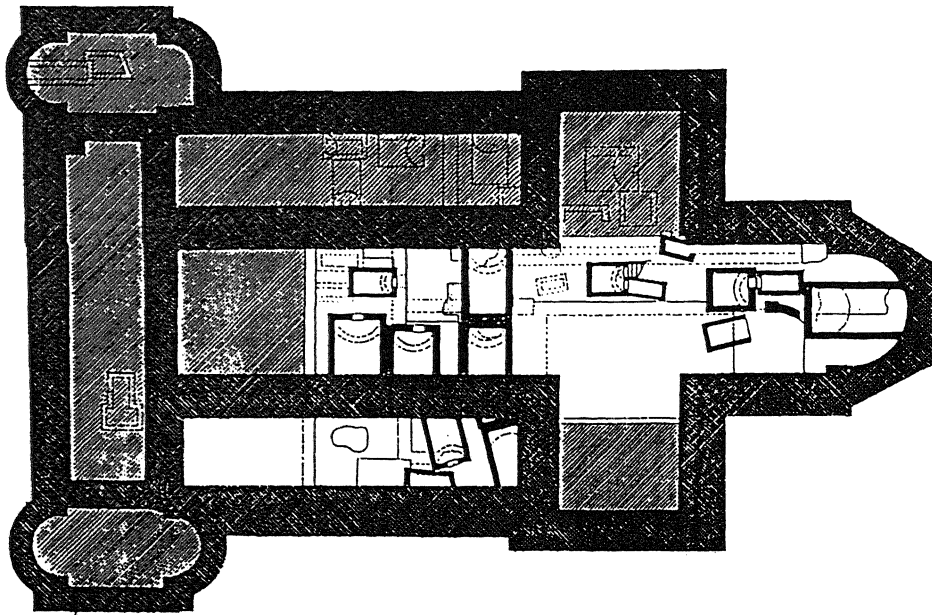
Plan at the archaeological level, elevation -2.50 m.
